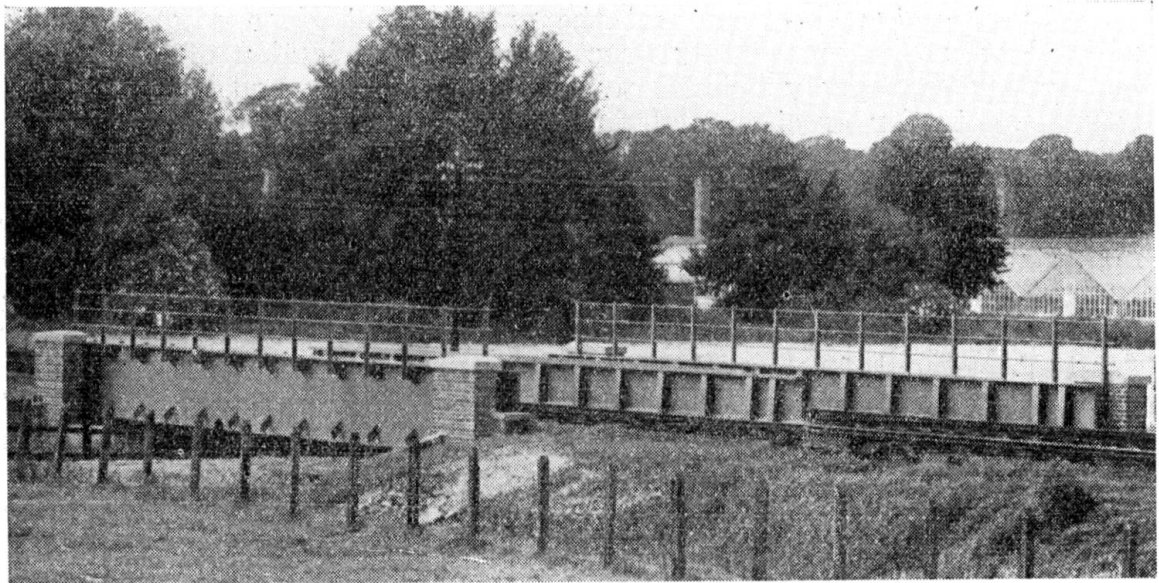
In welded plate girder construction intermediate stiffeners are not always necessary on the outside of the outer girders
